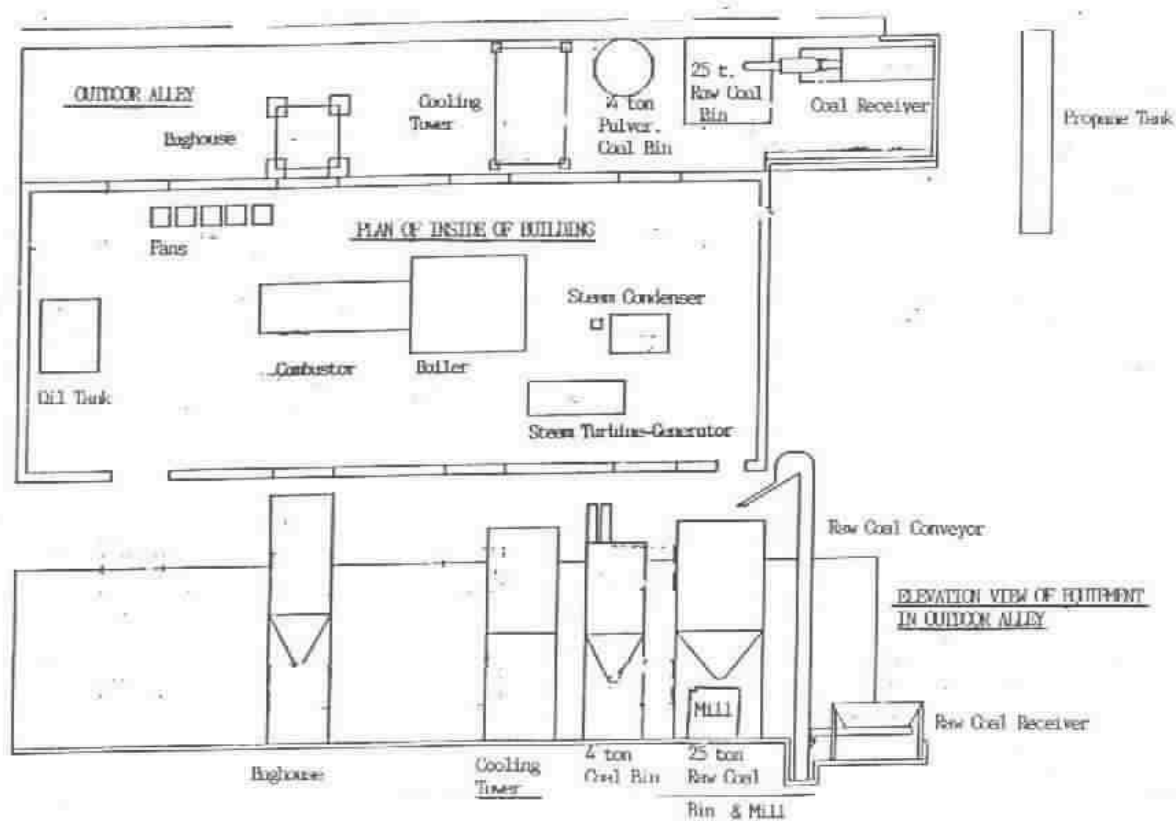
Plan (top) & Elevation (Bottom) Sketch of the Original 500 kW Power Plant for task 5
